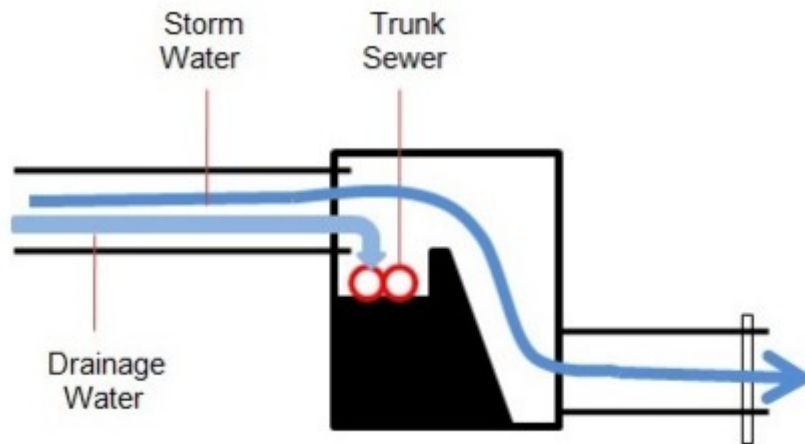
Typical Outfall Manhole Intercepting Fair Weather Flow Consisting of Sewage Water and Allowing Storm Water to Over Flow in River.
